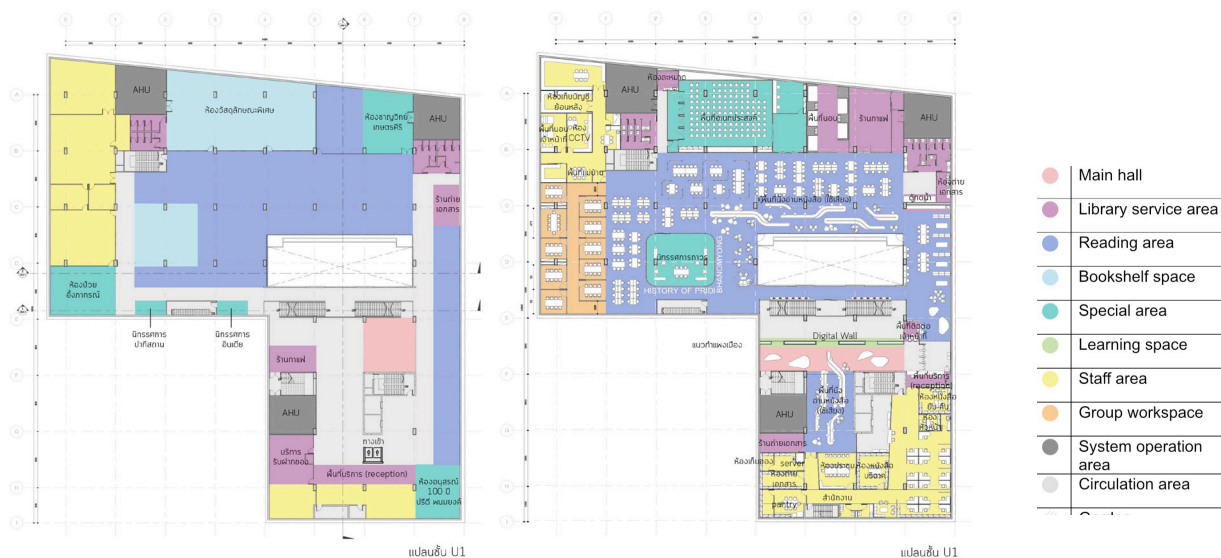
Comparison of U1 floor plan (left) Current plan and (right) New plan.
